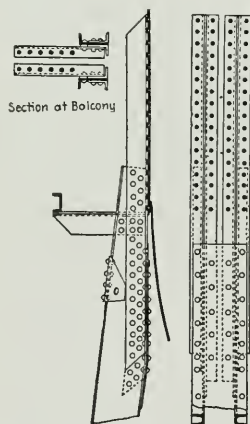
Detail of Attachment of Tank Shell to Tower Post and Circular Girder Construction.
